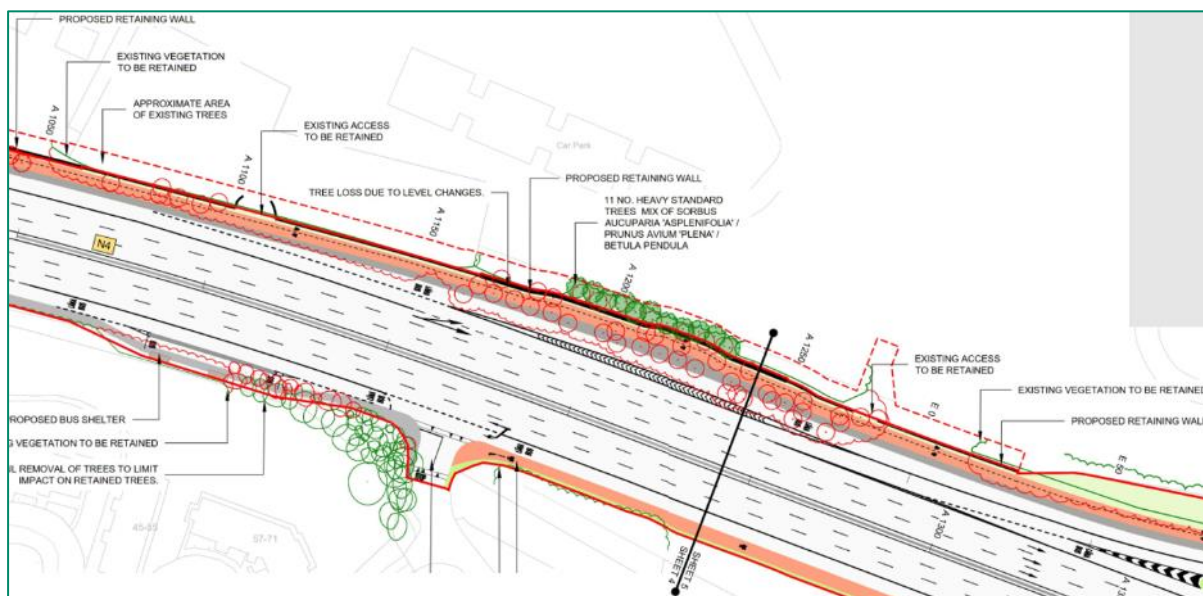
Extract from Landscape General Arrangement drawings at Hermitage Clinic
